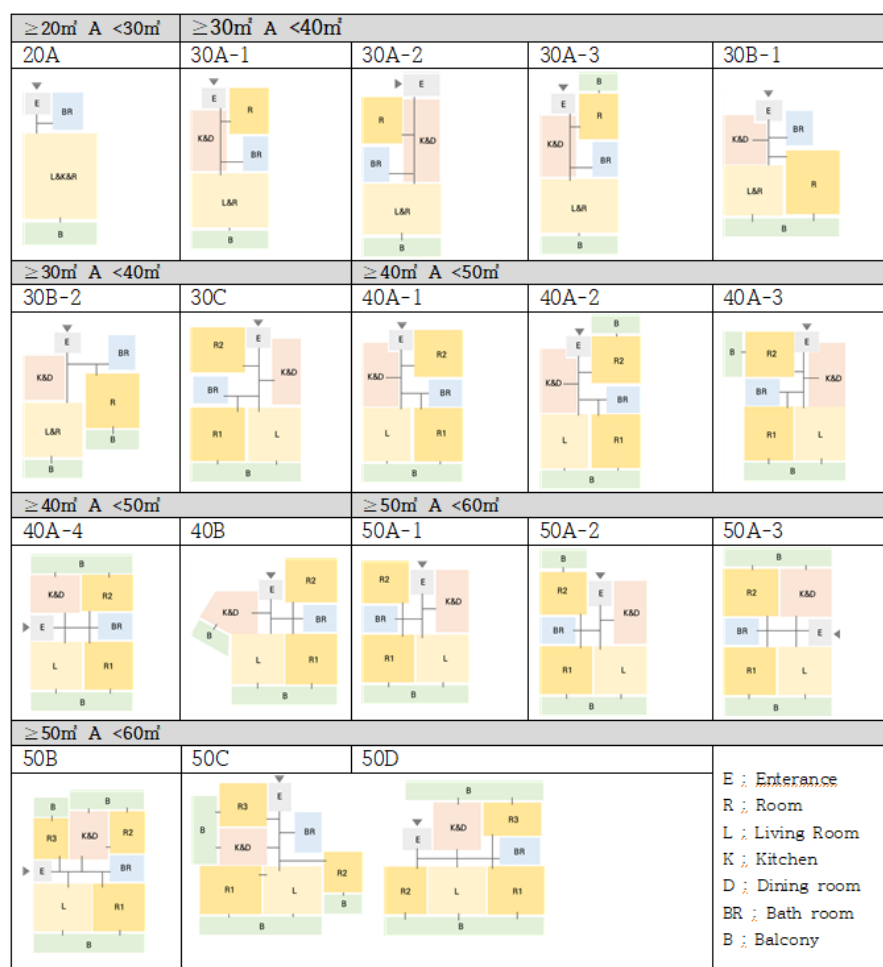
Types of spatial layout in public rental housing floor plans in the 2000s.
